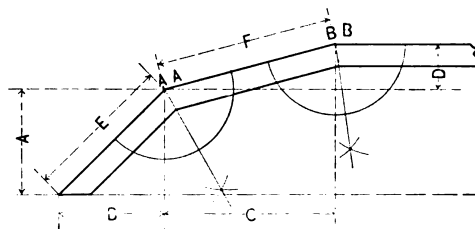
Finding the Bevels for Truss with Inclined Chords by Means of Bisecting or Intersecting Lines the Width of Members Used in Truss.
